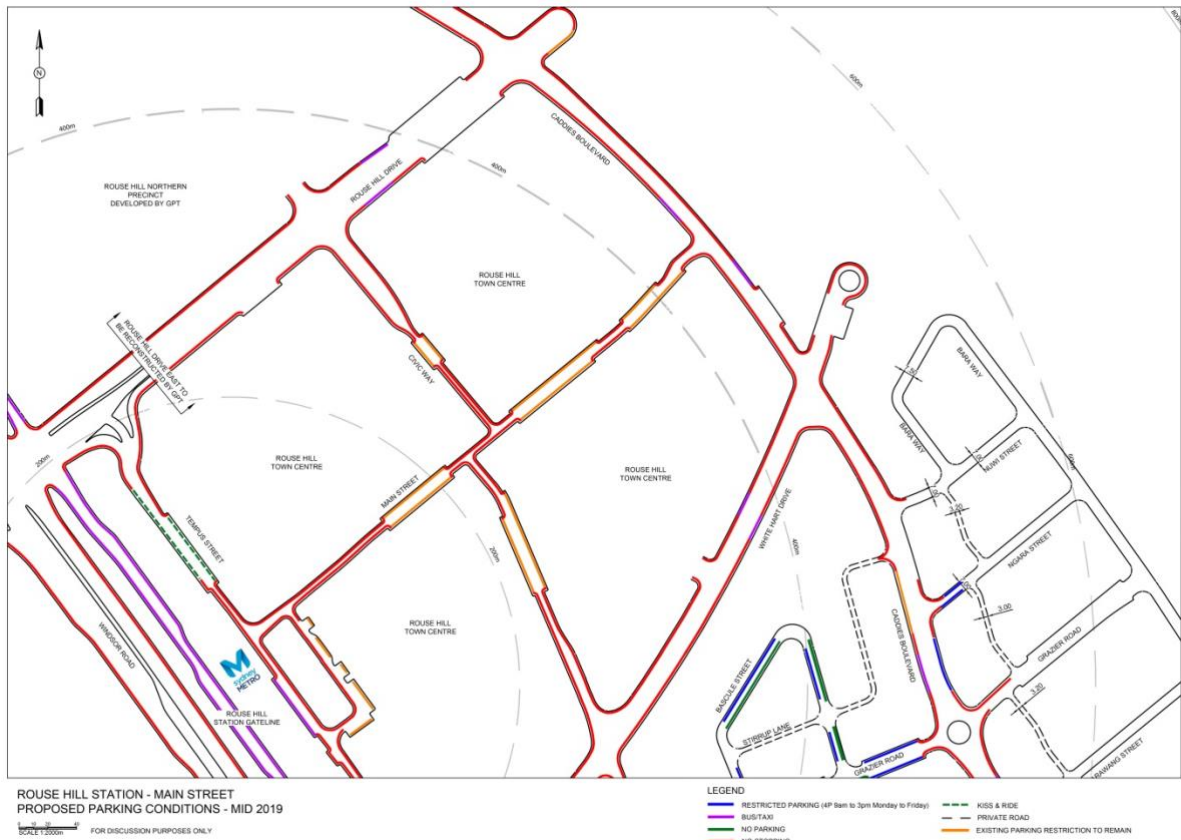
Proposed parking conditions mid-2019 – Rouse Hill streets north east of station
